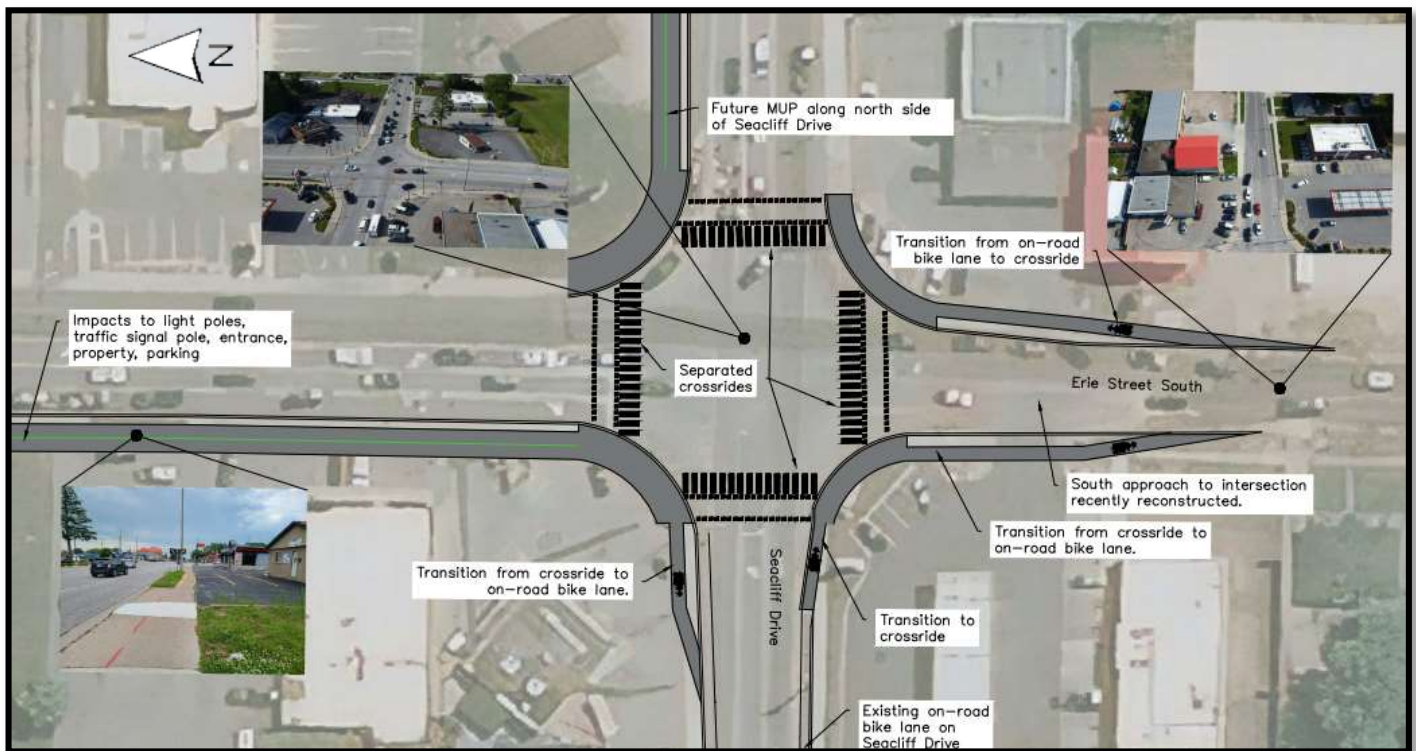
Erie Street at Seacliff Drive AT Facilities
